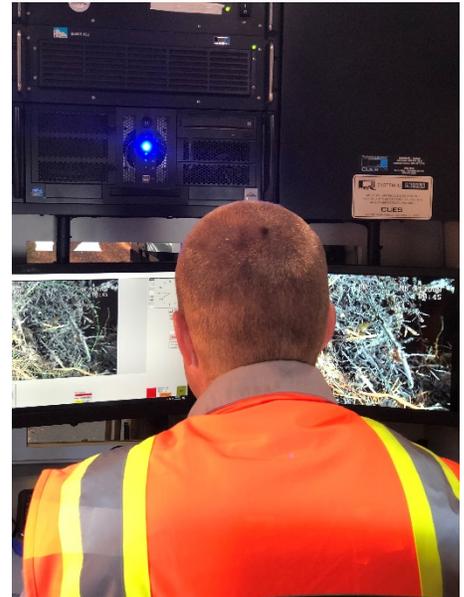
Collections staff conducting a pipeline inspection - finding and documenting root intrusion from a lateral using the CCTV Camera Van.
